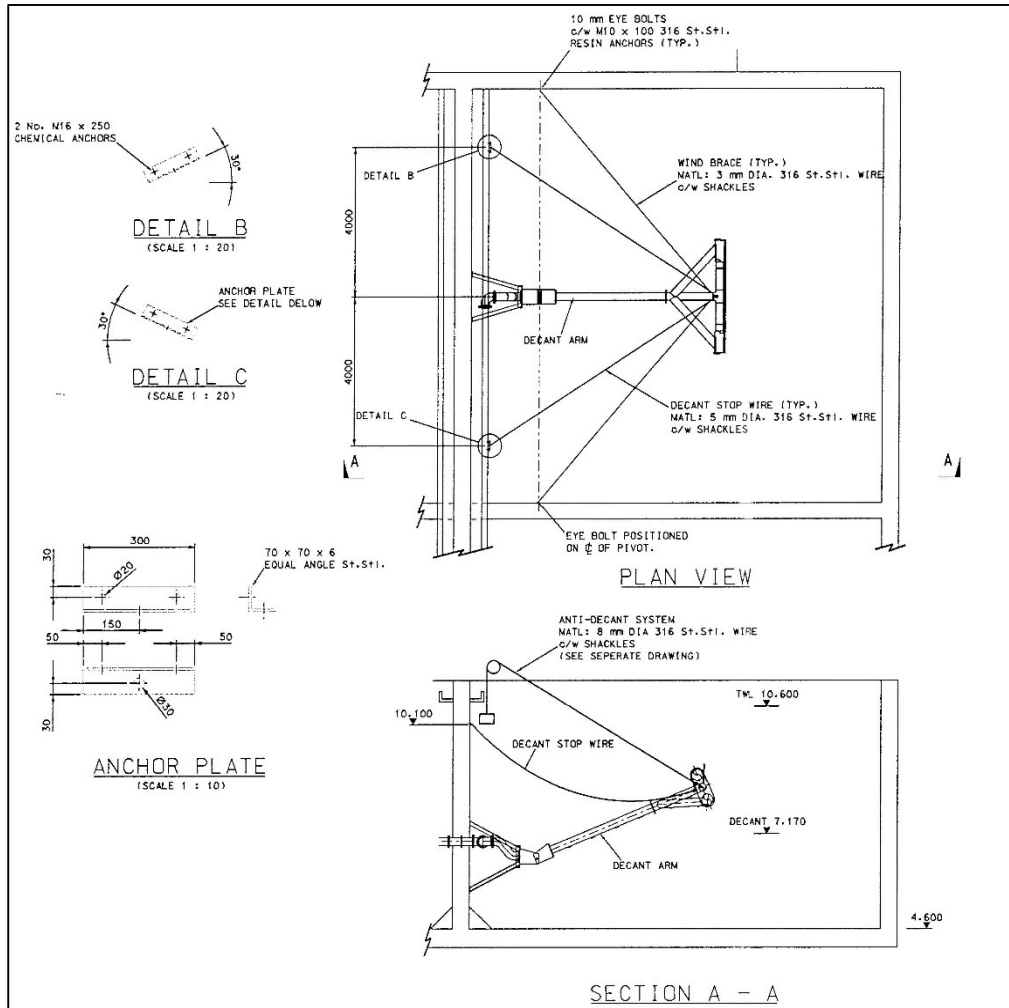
Illustrated plan and sectional views of SBR decant infrastructure
